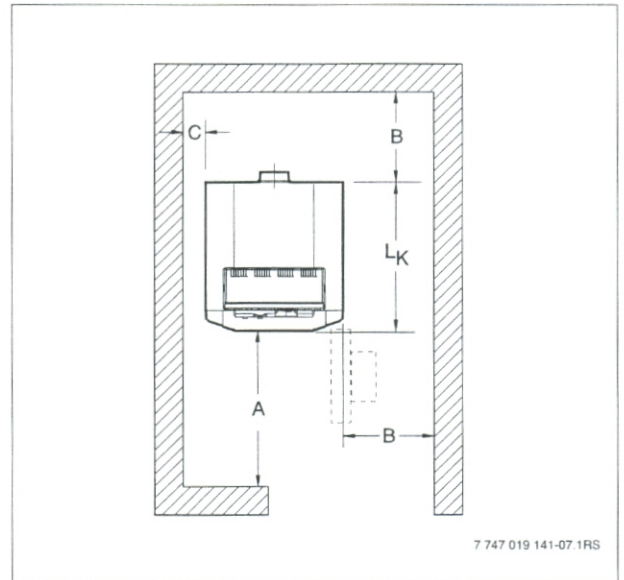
Boiler room clearances (boiler positioned on the l.h. or r.h. side)
